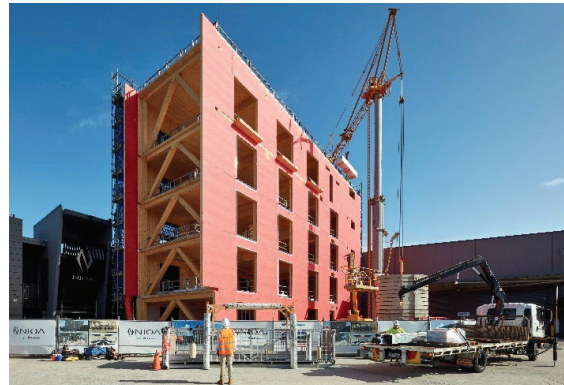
NIOA Timber Tower MET structure (KIRK & Aurecon)
